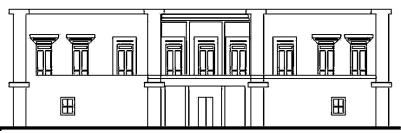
South elevation of a traditional building in Urumye (Sartip M., 2009)
